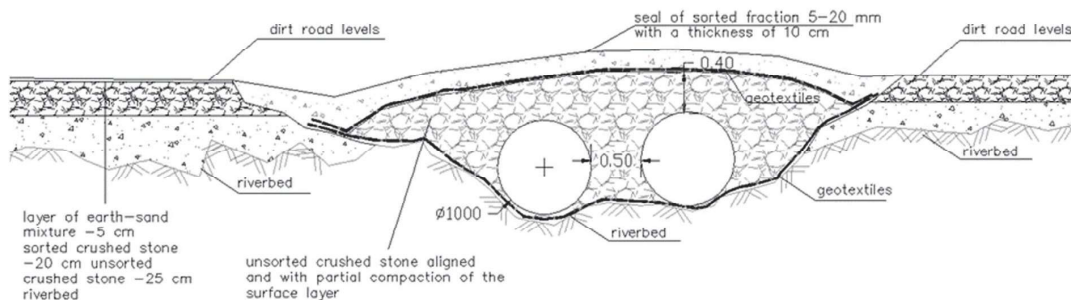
Typical longitudinal section of dirt road (ford) through the riverbed in a section above culverts
